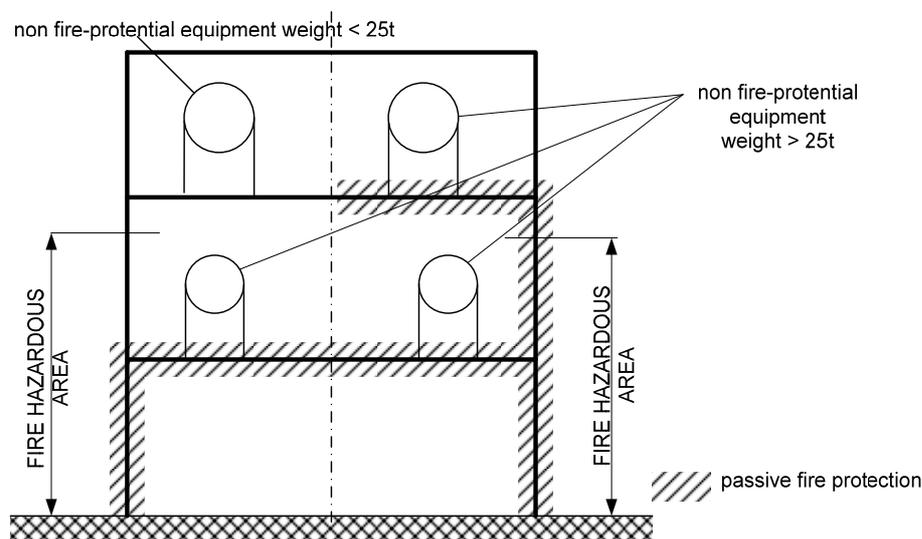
C - Structure Supporting non-Fire Potential Equipment > 25t
